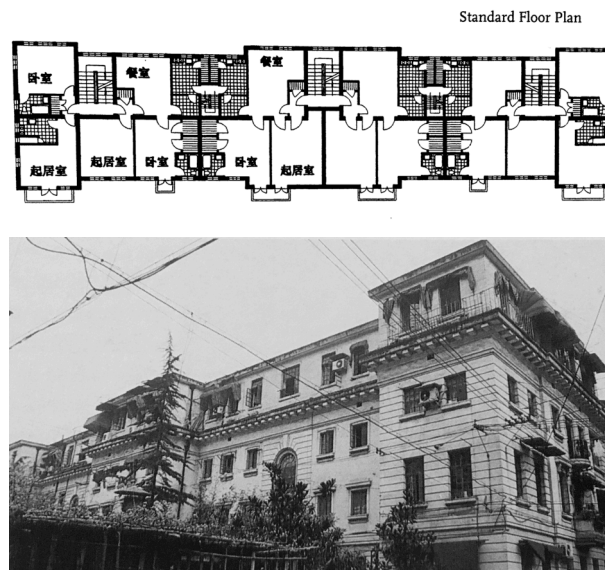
Row-pattern Apartment *Lilong* standard plan and photo
